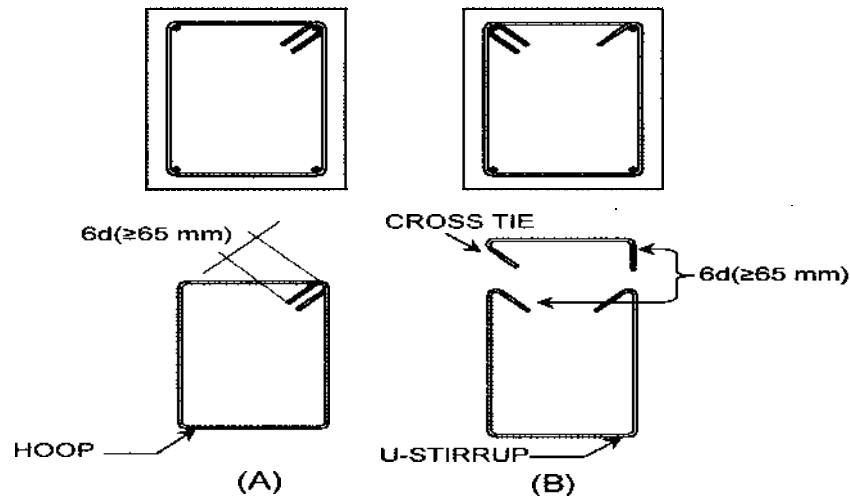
DETAILS OF TRANSVERSE REINFORCEMENT IN BEAMS
